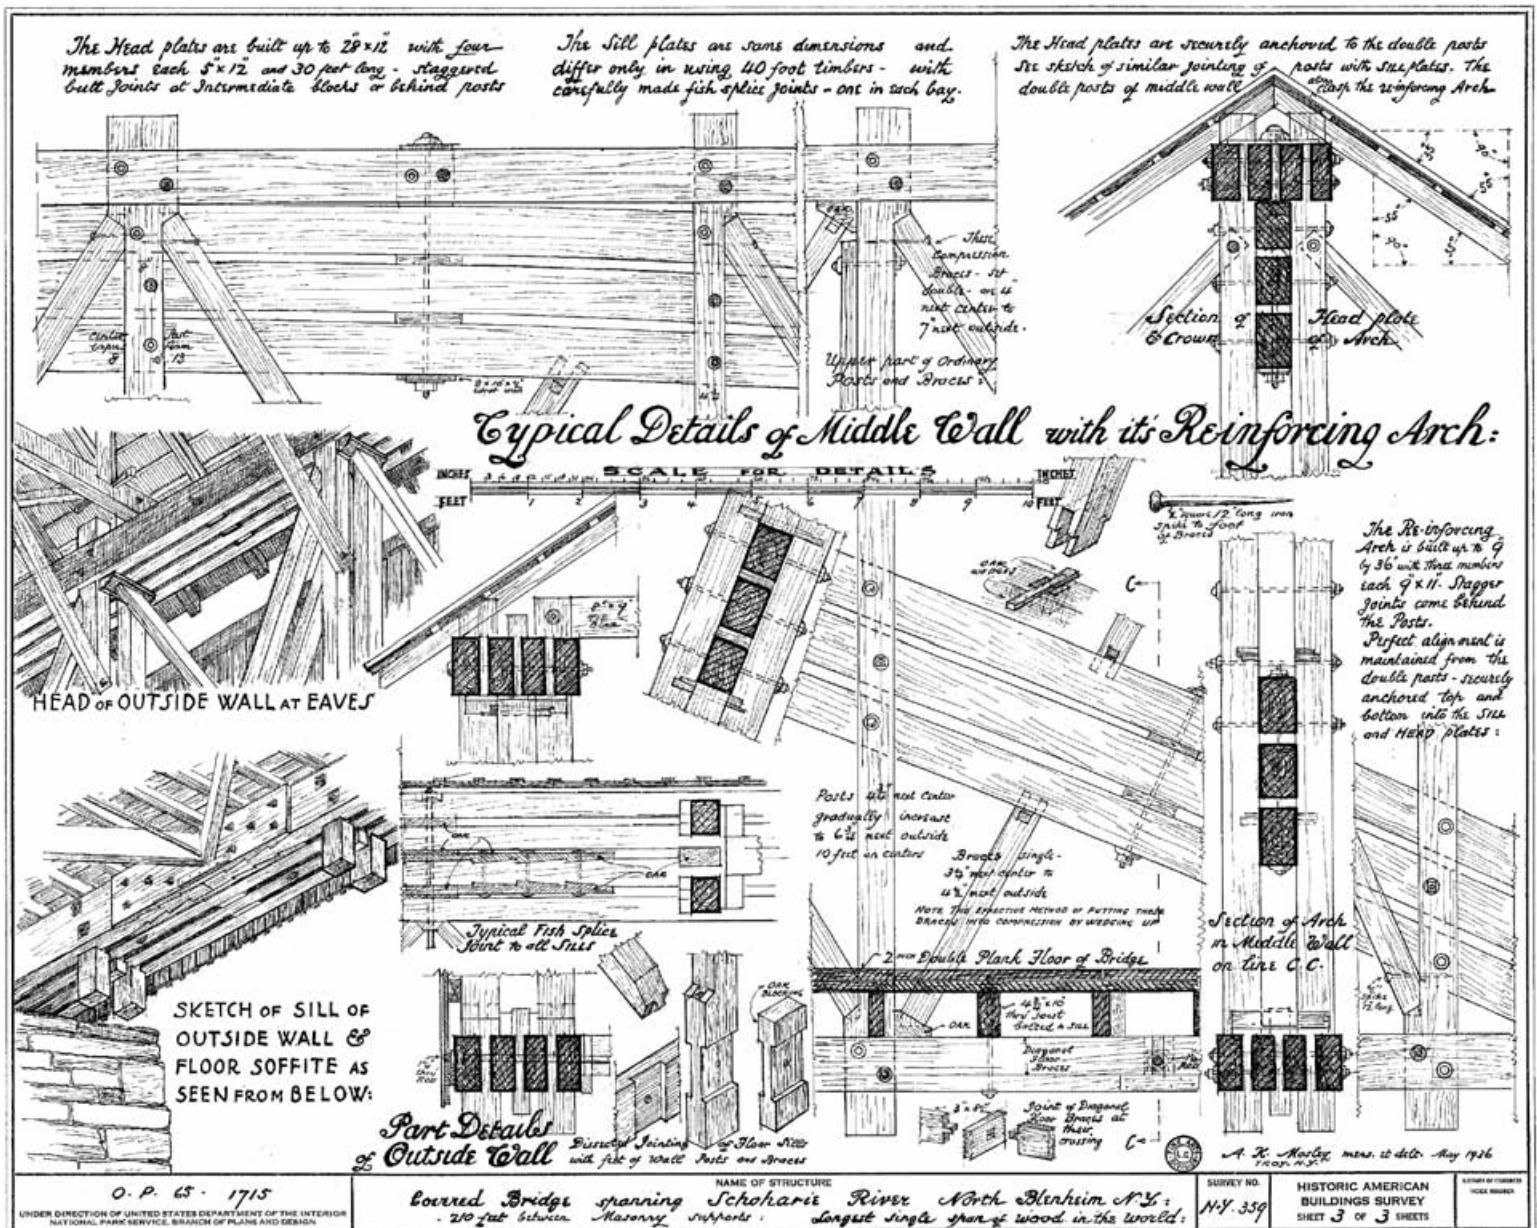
One of three sheets of Historic American Buildings Survey drawings made in 1936, this one showing details of central truss. Remaining sheets (available at loc.gov/pictures/item/NY0745, along with more photos) show part side and end elevations and plan views of floor and roof framing.
